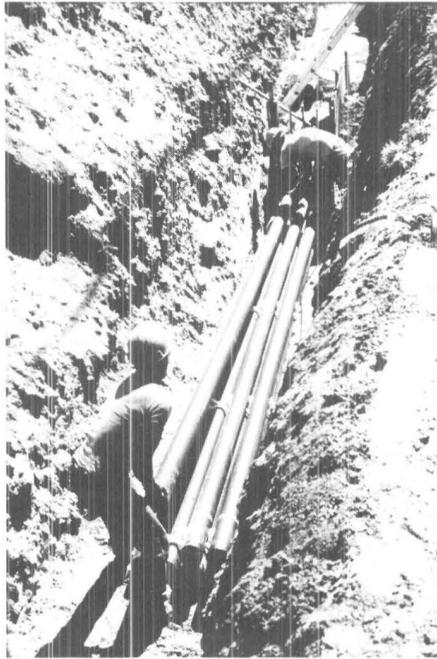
Plastic conduit, 1968. The 20-foot sections of 4-inch polyvinylchloride ducts are cemented together in waterproof bell and spigot joints.
